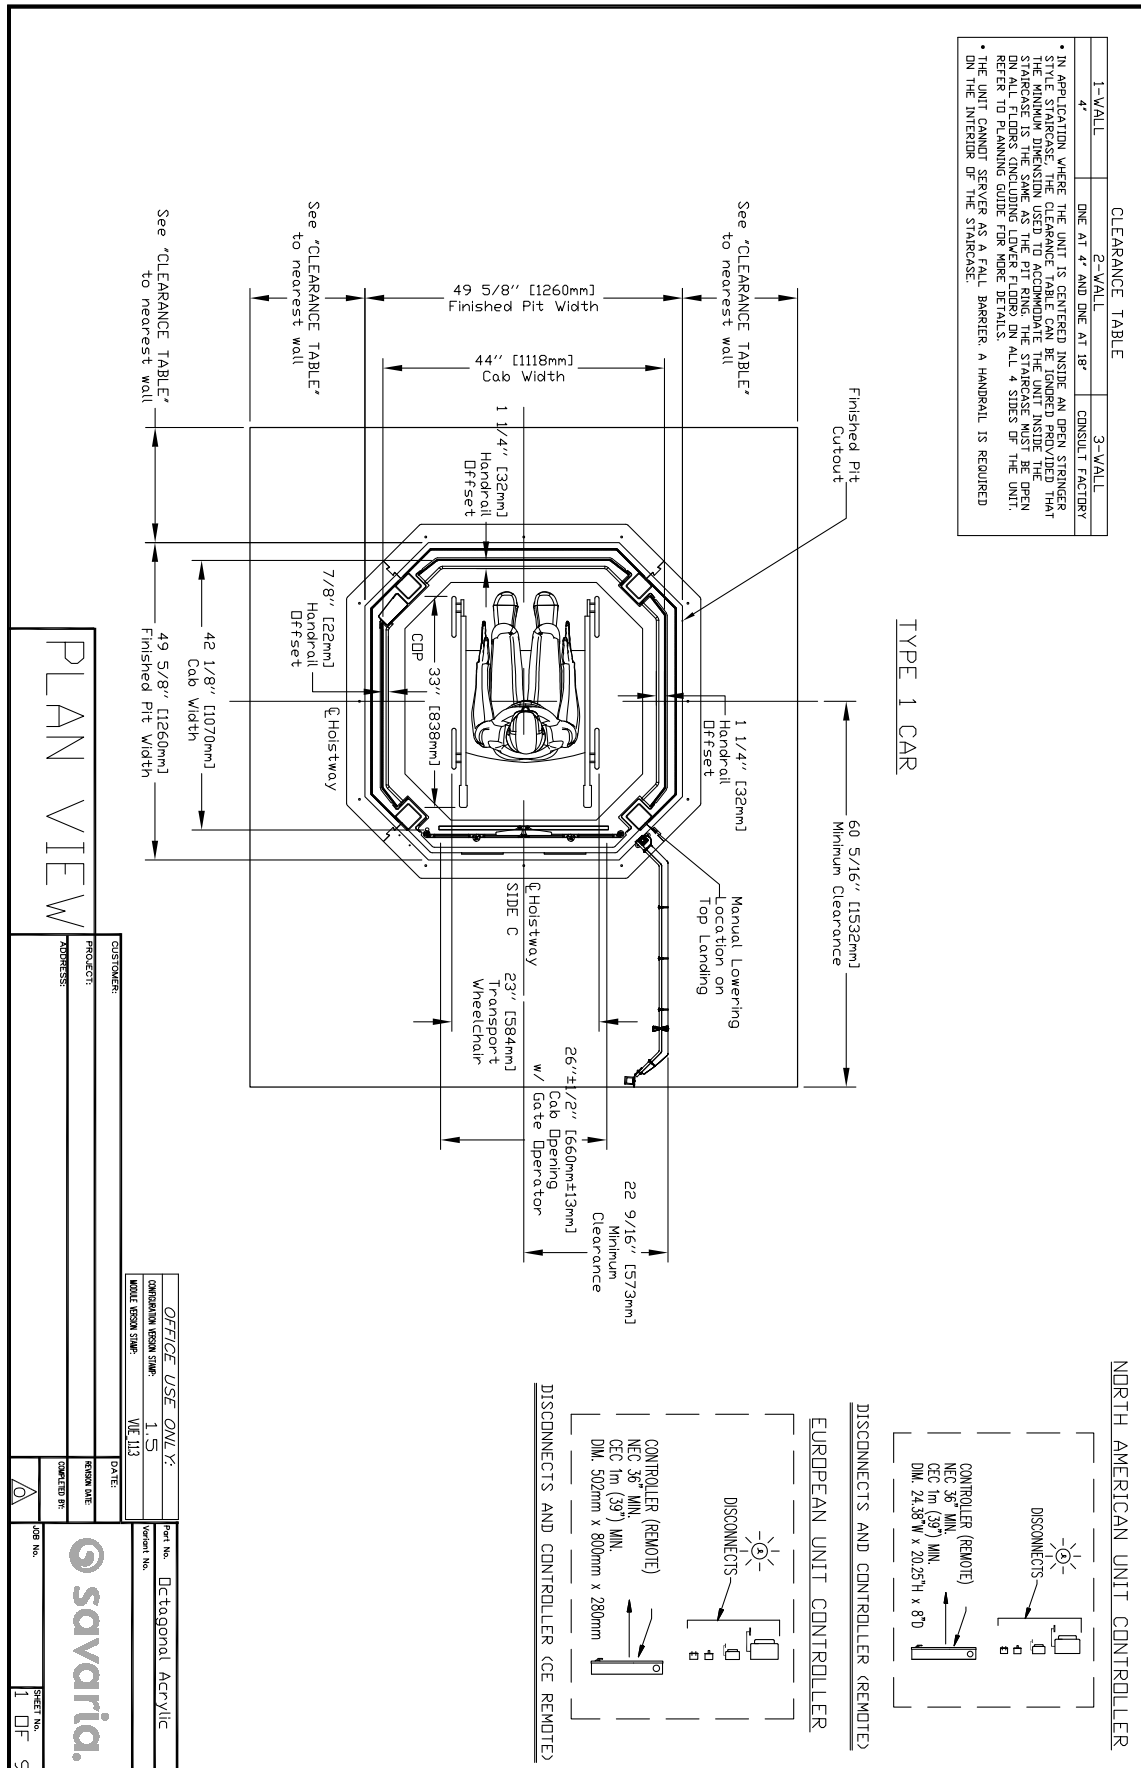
Plan view - octagonal acrylic (OAM) type 1
